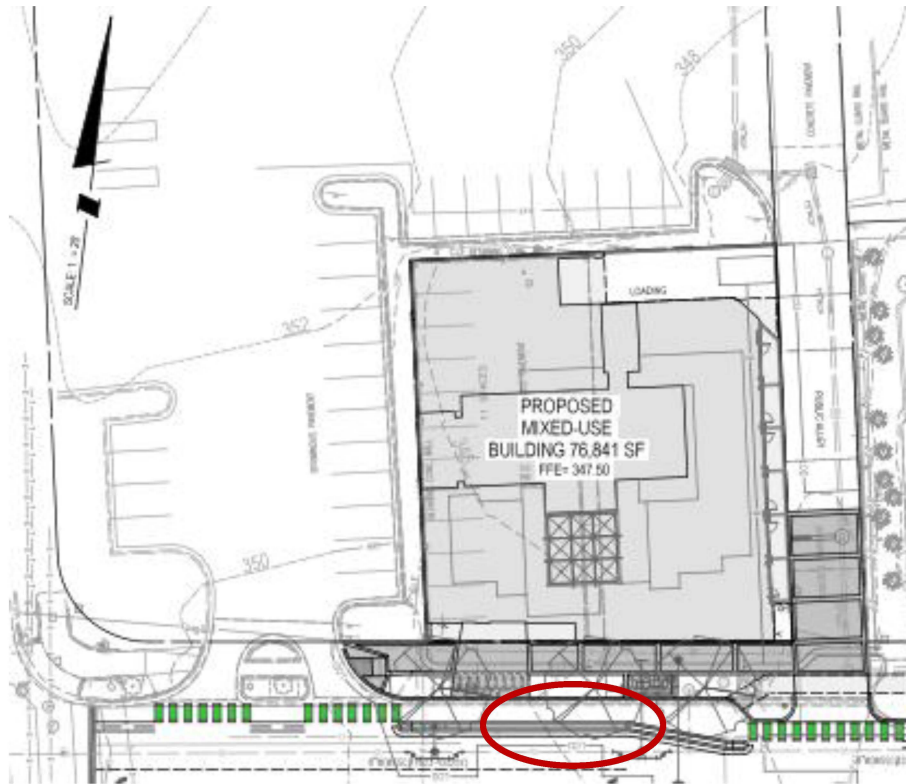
Eastern Driveway Entrance on Cheltenham Drive – Project Site Plan Design
